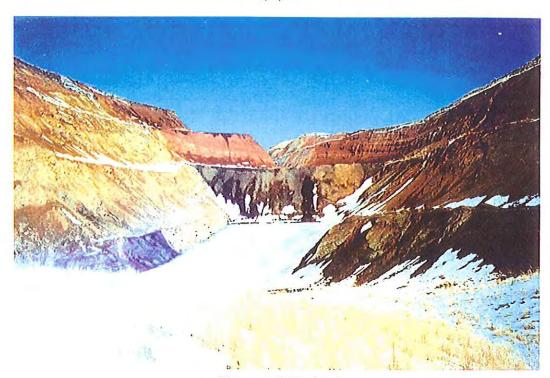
SW side of J culverts fix or use for fill 3/2/00
